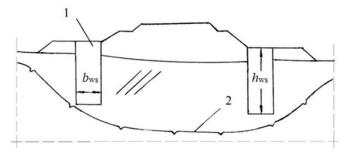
Diagram of reinforcing embankment footing on thawing permafrost soils: 1 – reinforced soil; bws is the width of the wall in the soil; hws is the reinforcement depth; 2 – permafrost table (PFT)
